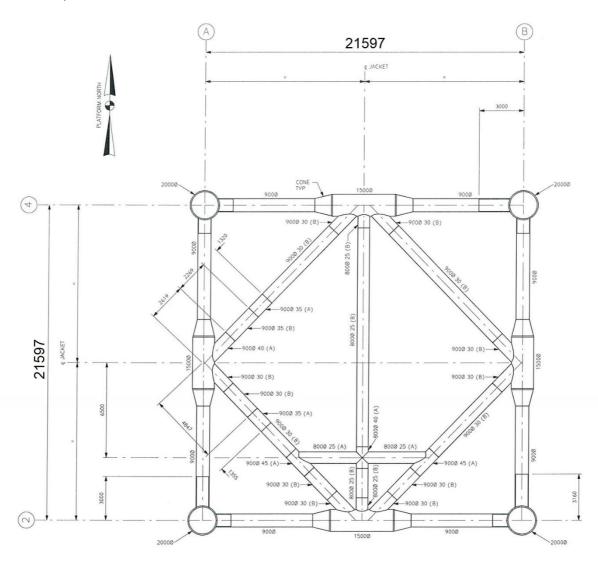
Solan jacket bracing plan at EL. +10.000
